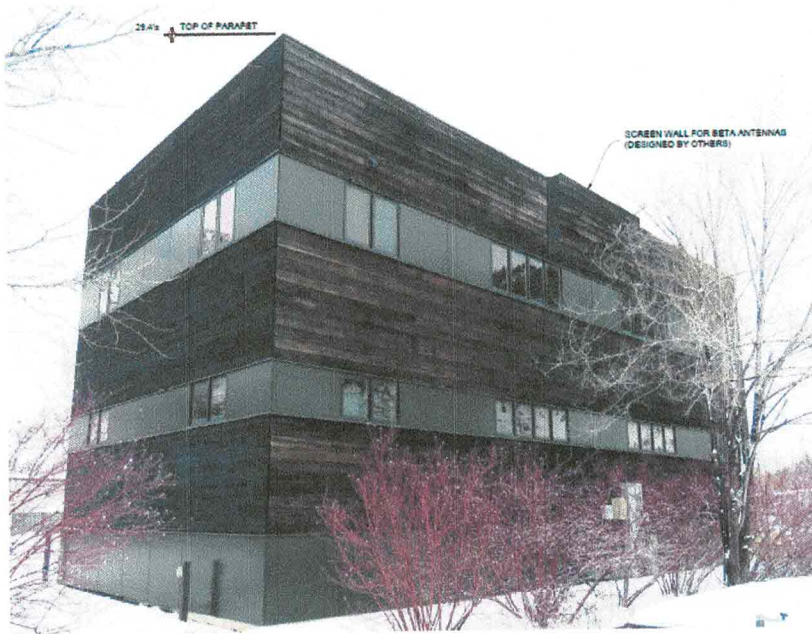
Proposed Stealth Screen Wall-mounted structure for third sector
